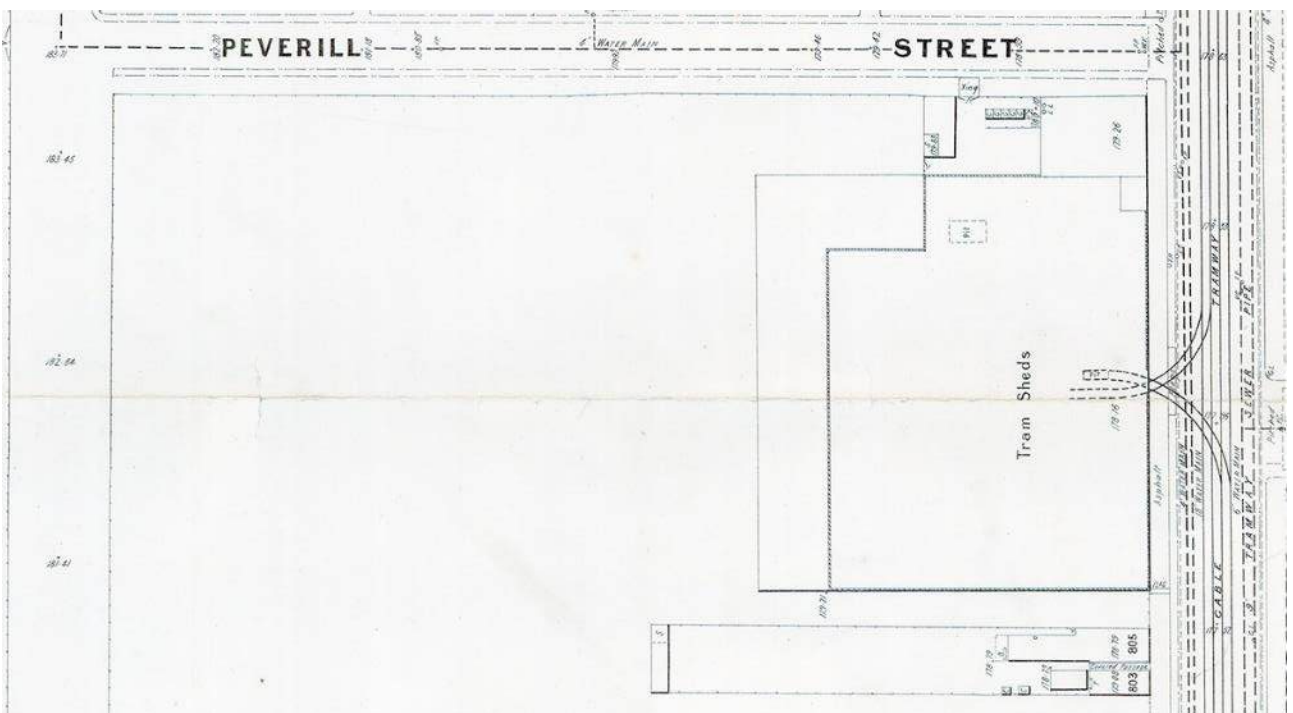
Detail of the Brunswick tram sheds from the 1908 MMBW Plan No. 1918 (MMBW 1908)
